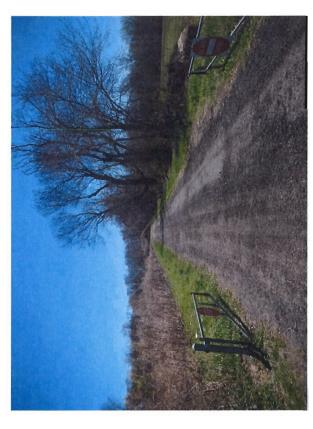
View of proposed access drive following existing gravel access drive, looking south.
